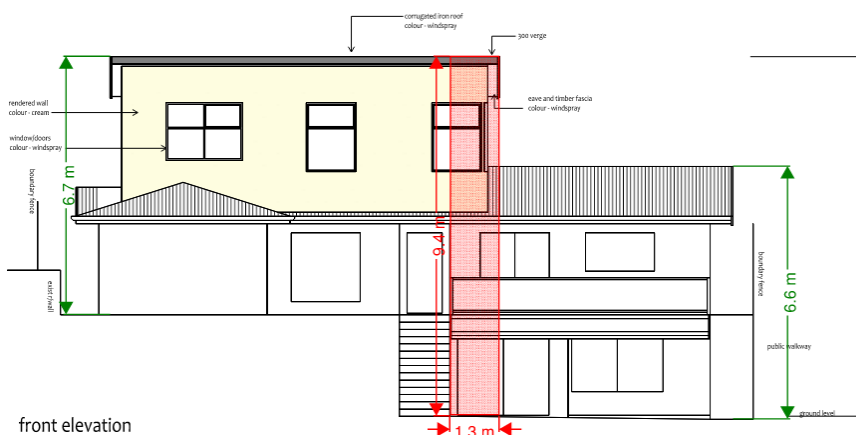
Continuous 3 building levels limited to a width of 1.3 metres when viewed from the front elevation
